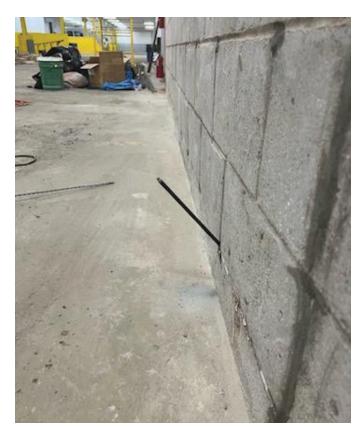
Extra-long injection ports used due to masonry block wall (Picture courtesy of Jeans Waterproofing)
